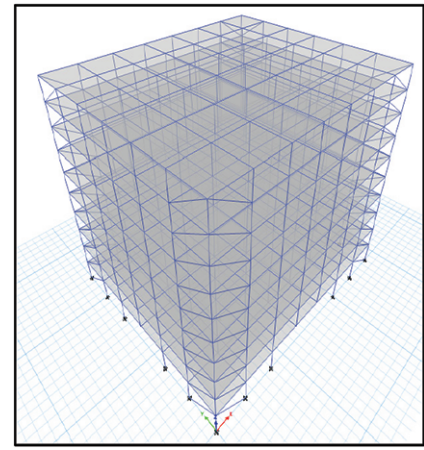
Regular model with floating column and bracing at Type-2 location – A6
